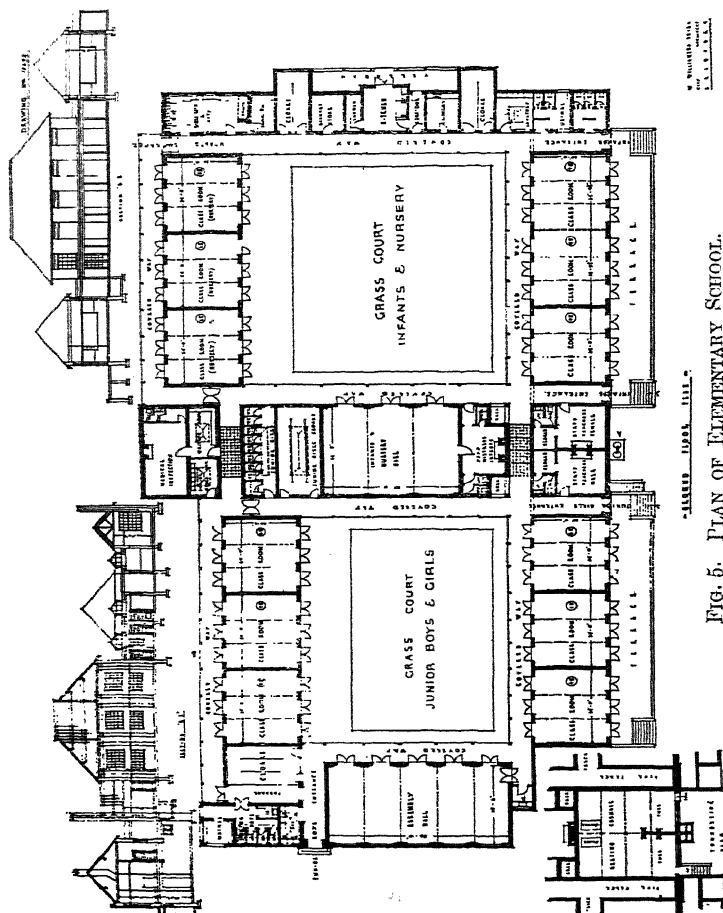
PLAN OF ELEMENTARY SCHOOL.
